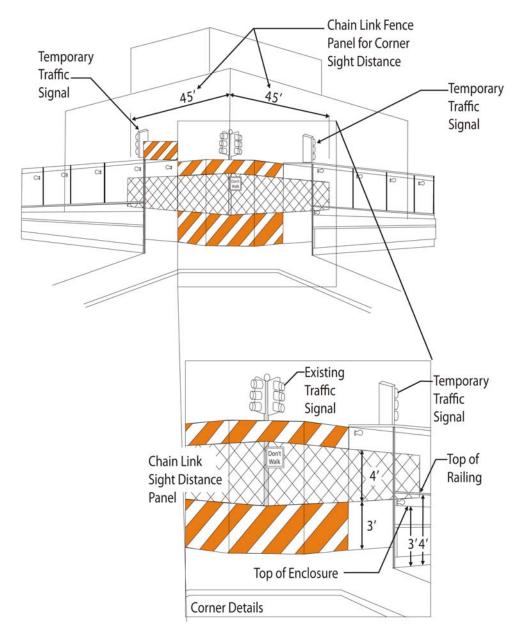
Temporary Covered Walkway with Fencing at Intersection Corner
